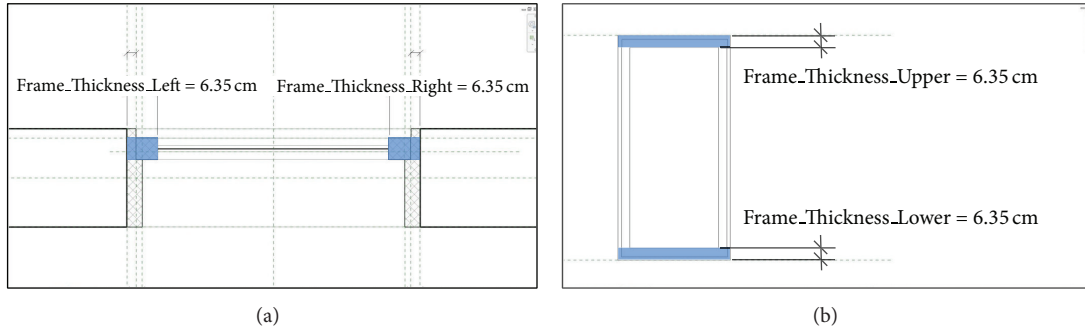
The window family in Revit, (a) a plan view and (b) an elevation view.
